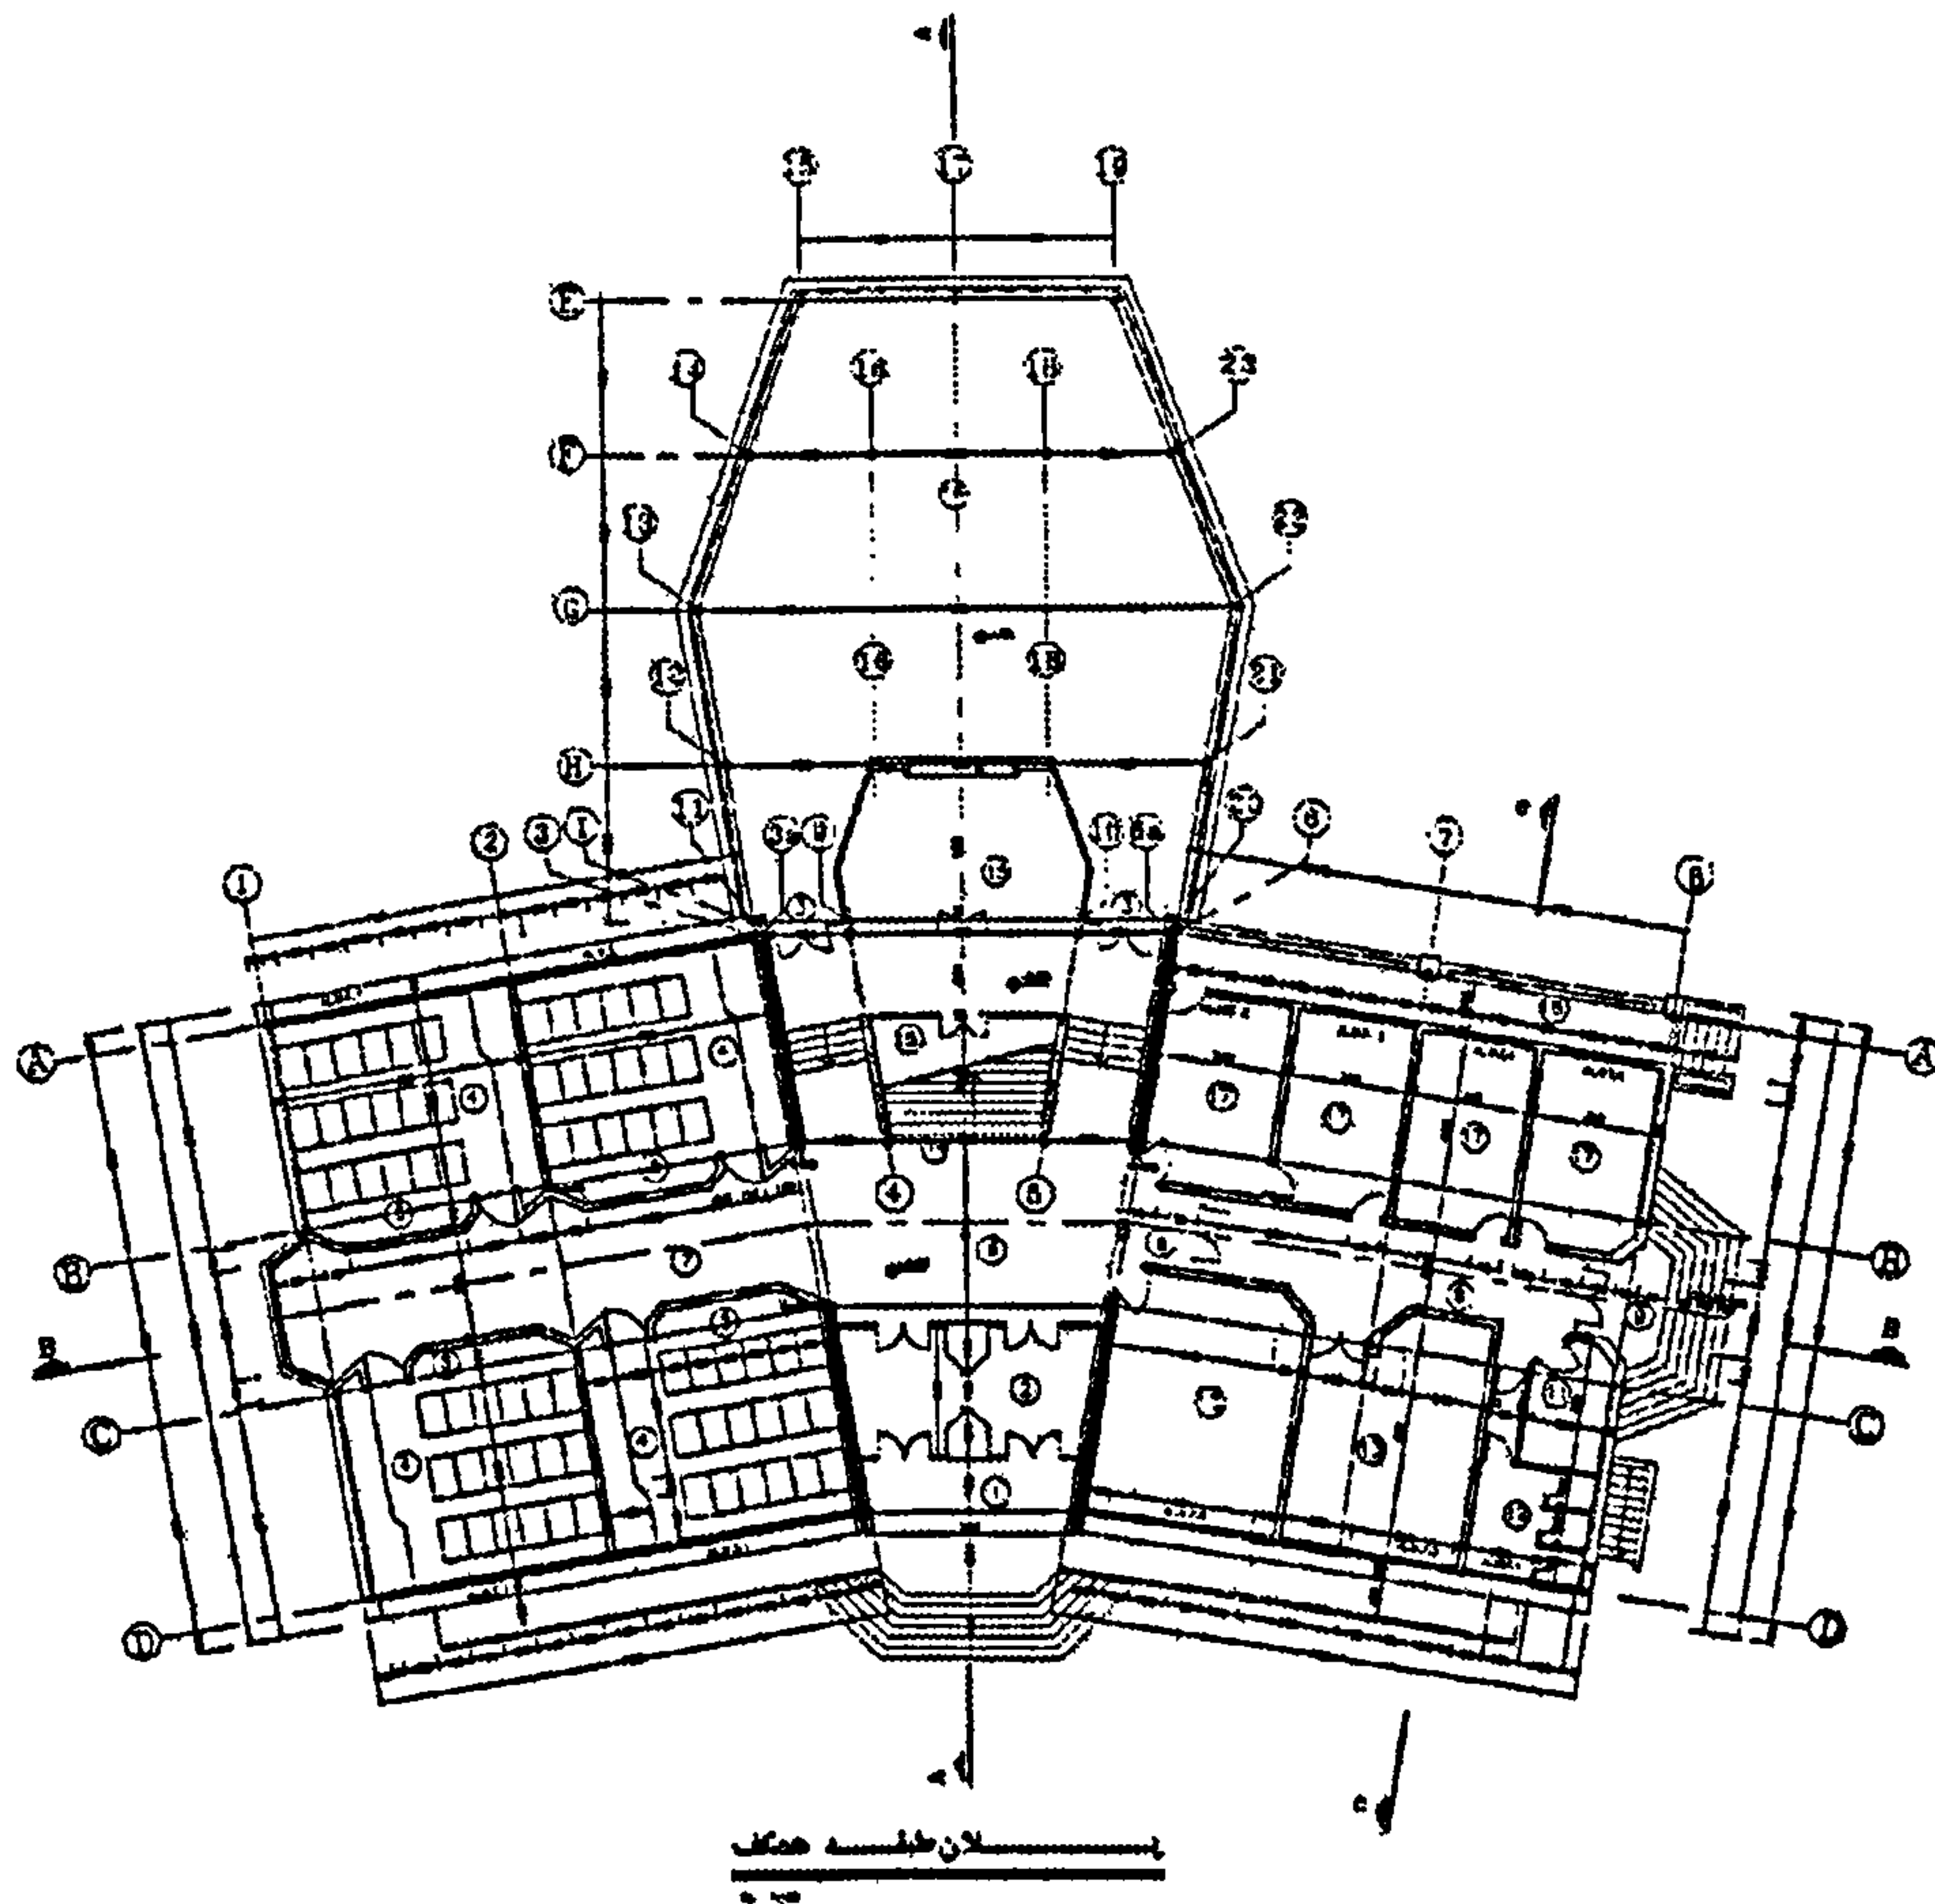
The plan of the low ground floor of a primary school with 20 classrooms (Number 1)
